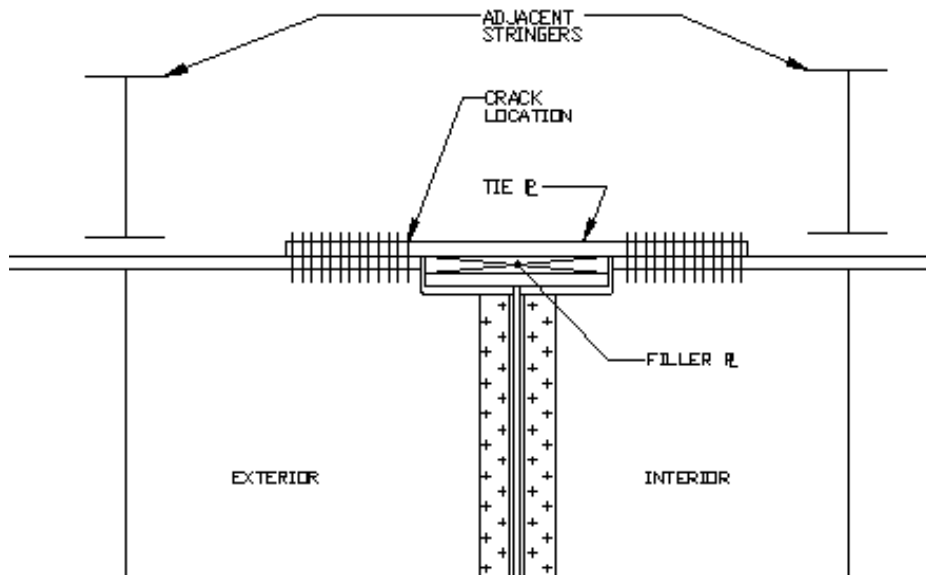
Detail of tie plate connection between interior transverse floor beam and exterior cantilevered transverse floor beam.
